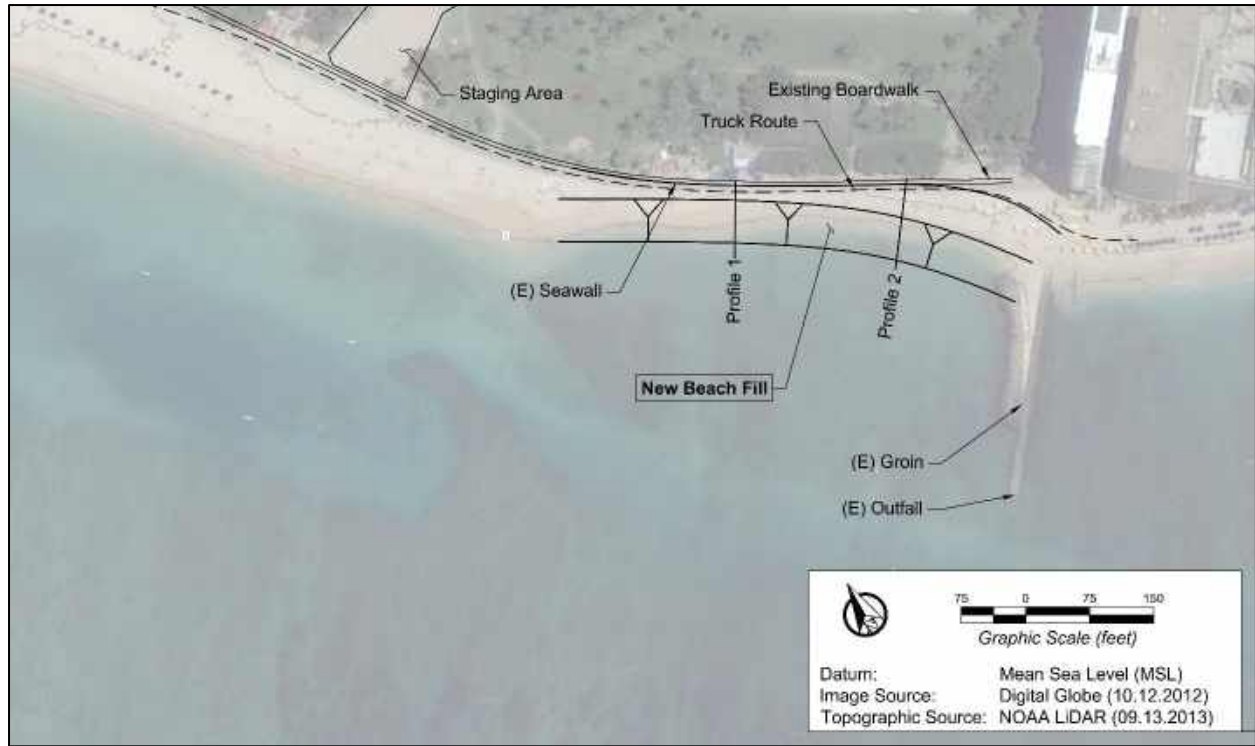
Project layout for proposed action – Fort DeRussy beach sector
